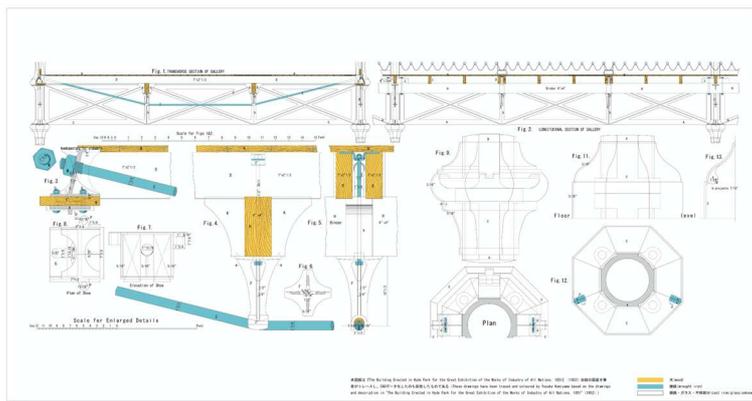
Floor system (slab and joist beam) in PL.14 (traced and colored by third author).
